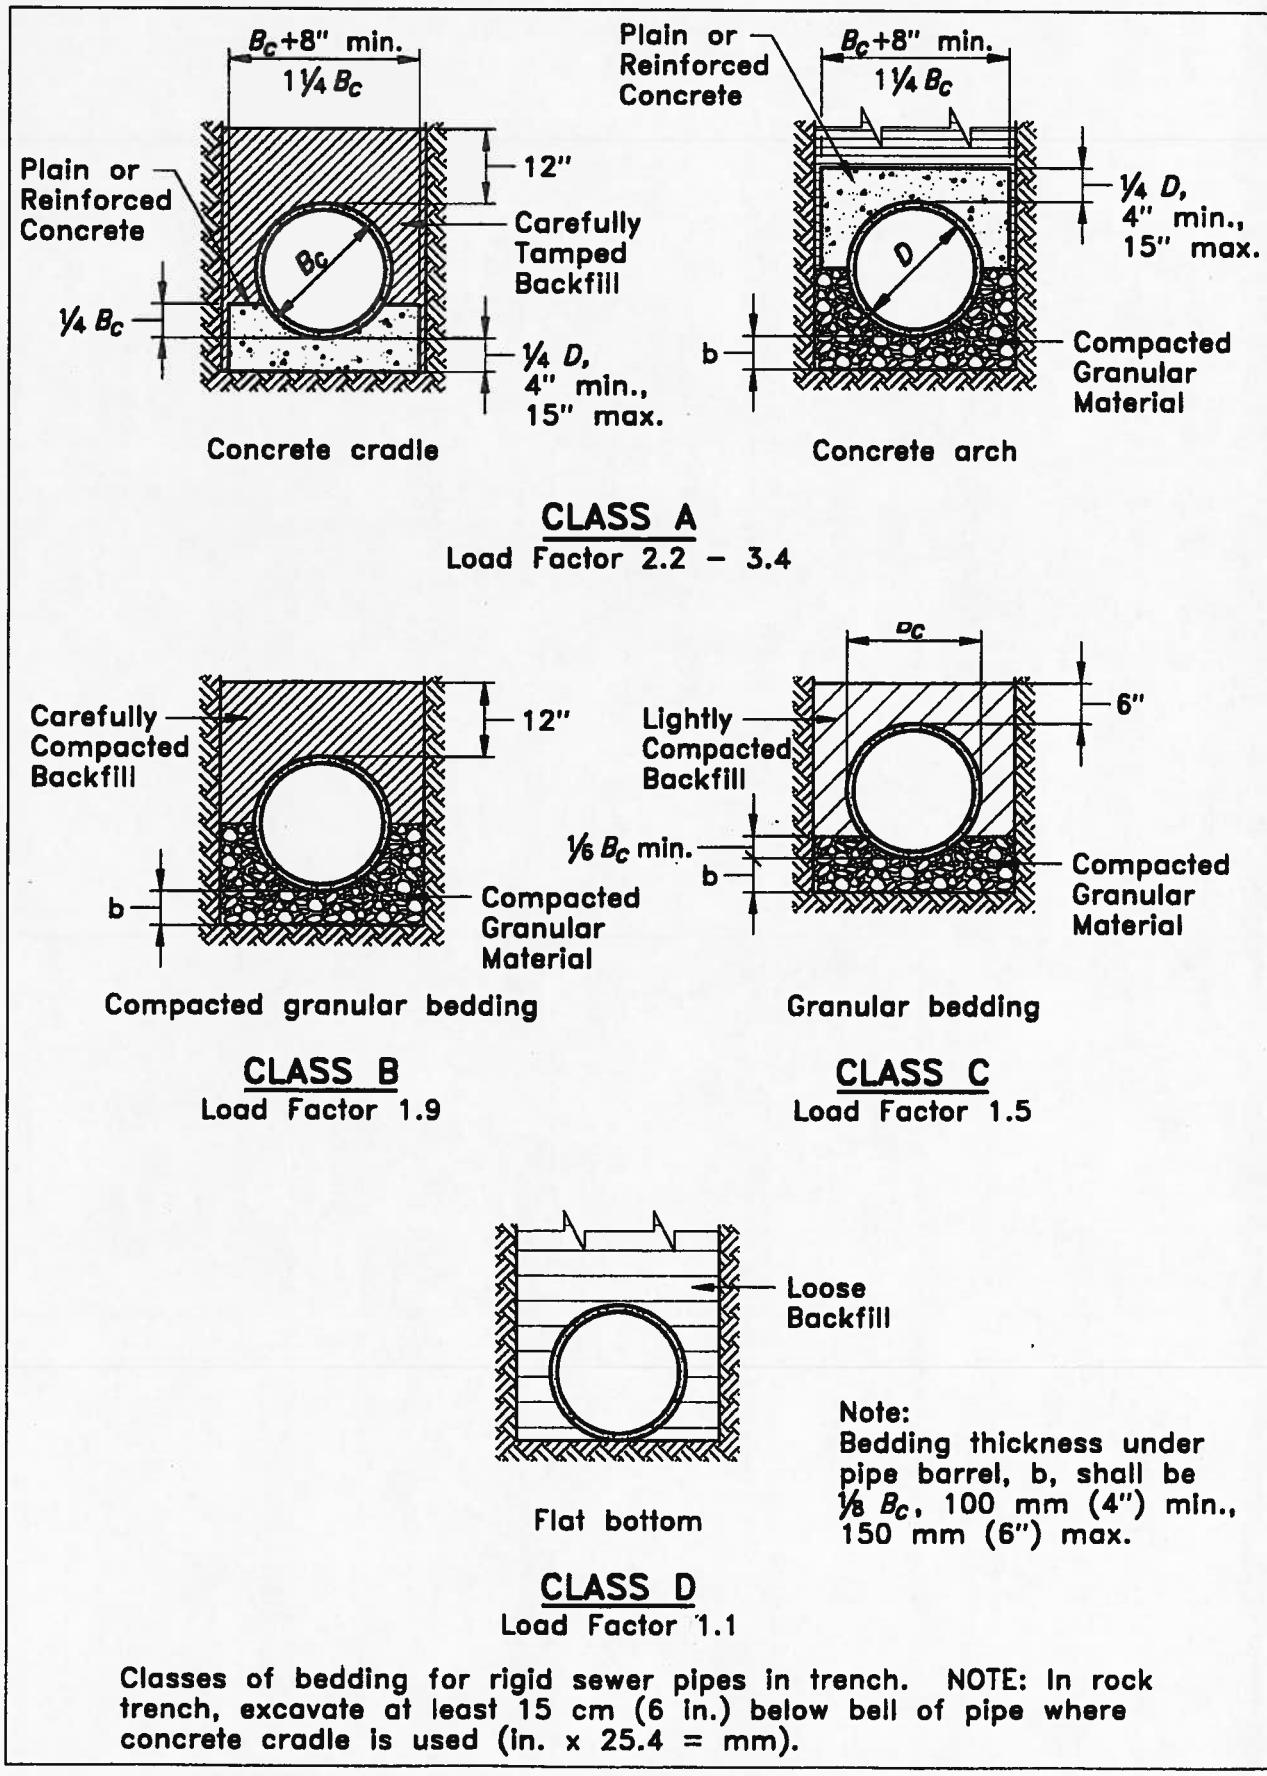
Bedding methods for rigid sewer pipes in trench. (From *Design and Construction of Sanitary and Storm Sewers, Manual of Practice No. 9*, ASCE 1969. Reprinted with permission from the American Society of Civil Engineers, New York, New York)
